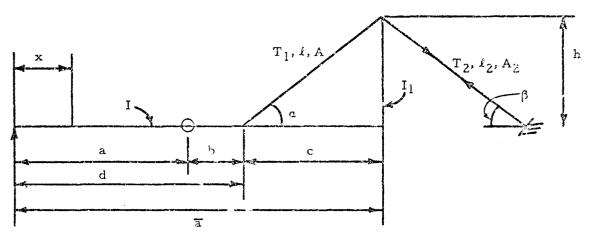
BRIDLE BRIDGE, ELEVATION VIEW
